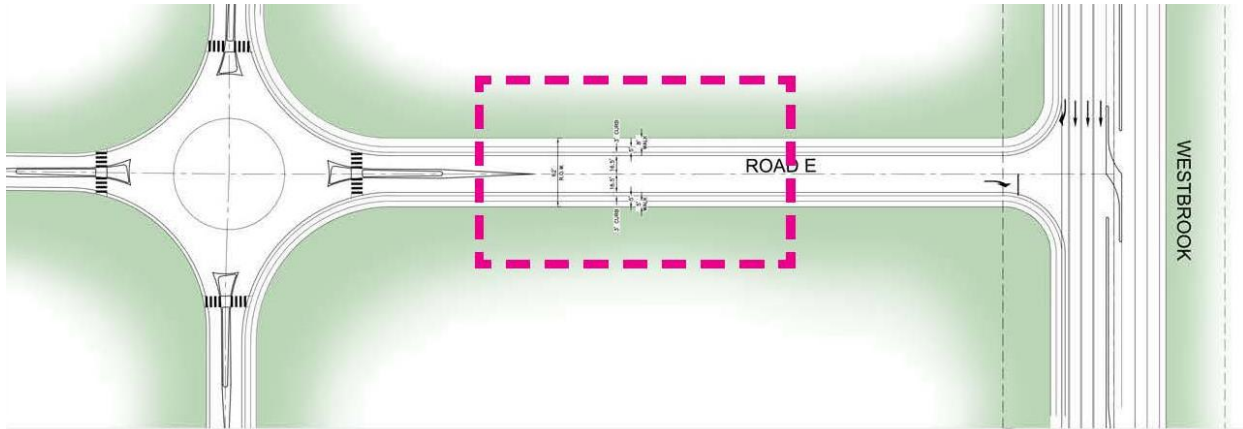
3: Modified Primary Residential Street Connections – Road E
